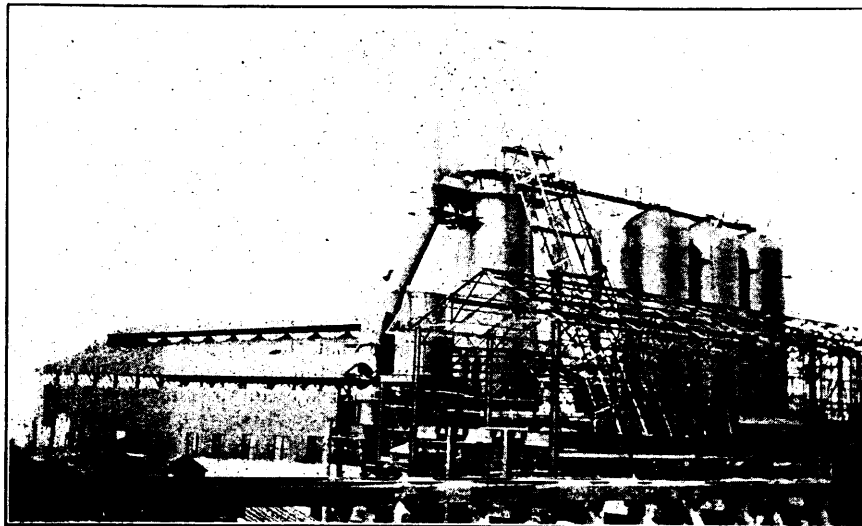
HAMILTON STEEL AND IRON CO.'S PLANT—NEW BLAST FURNACE SHOWING ORE LOADING ARRANGEMENT, CAST SHED STOVES AND ORE SHED.
